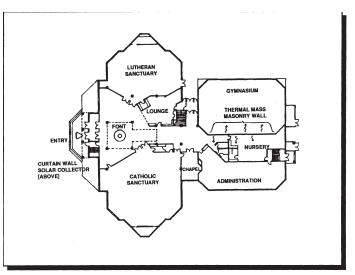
Ground Floor Plan (Ecumenical Centre)
